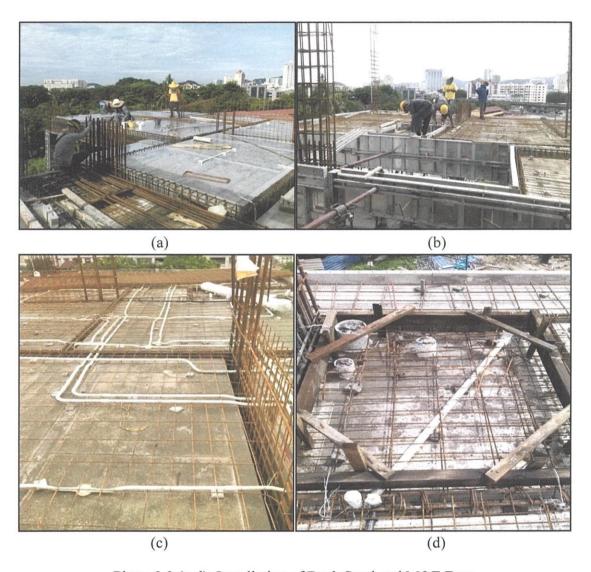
(a-d): Installation of Deck Steel and M&E Duct
